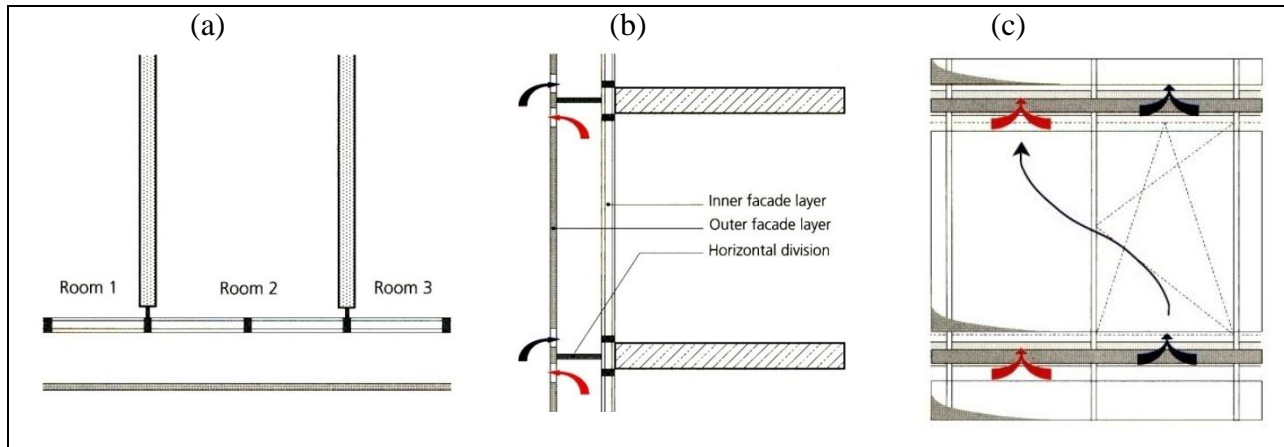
Corridor facade: plan (a); section (b) and elevation (c) (Osterle, 2001)
